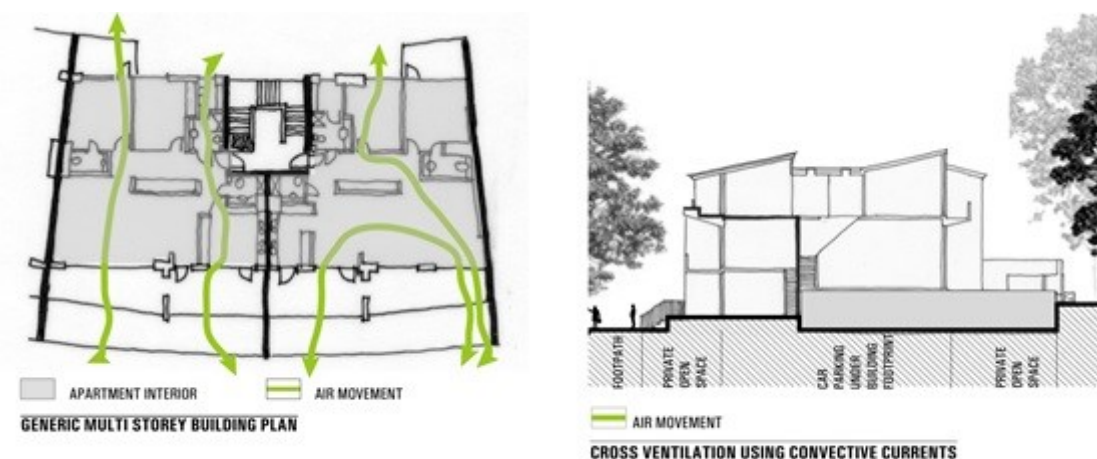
Building plan demonstrating how acceptable cross ventilation can be achieved
